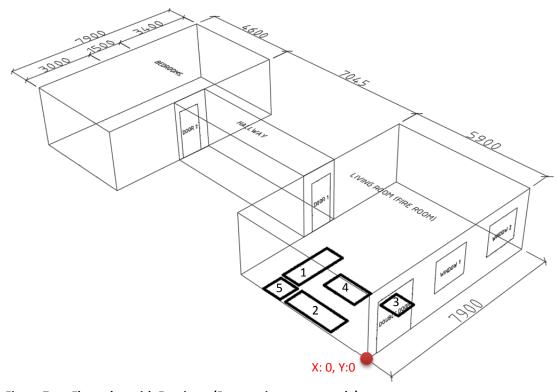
Floor plan with Furniture (Perspective, not on scale)
